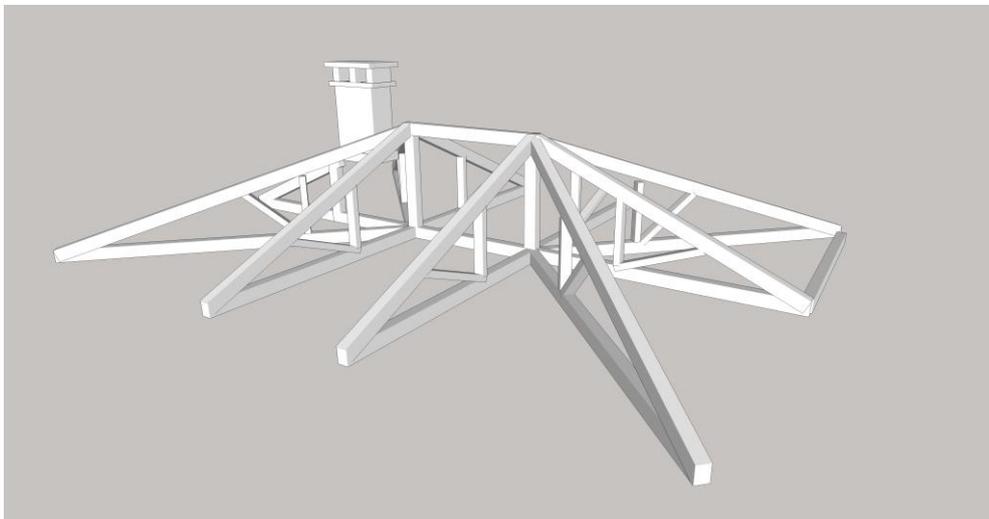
A Sketchup model simulate the original roof truss system. (Source: Built by Zenny Cheung)
